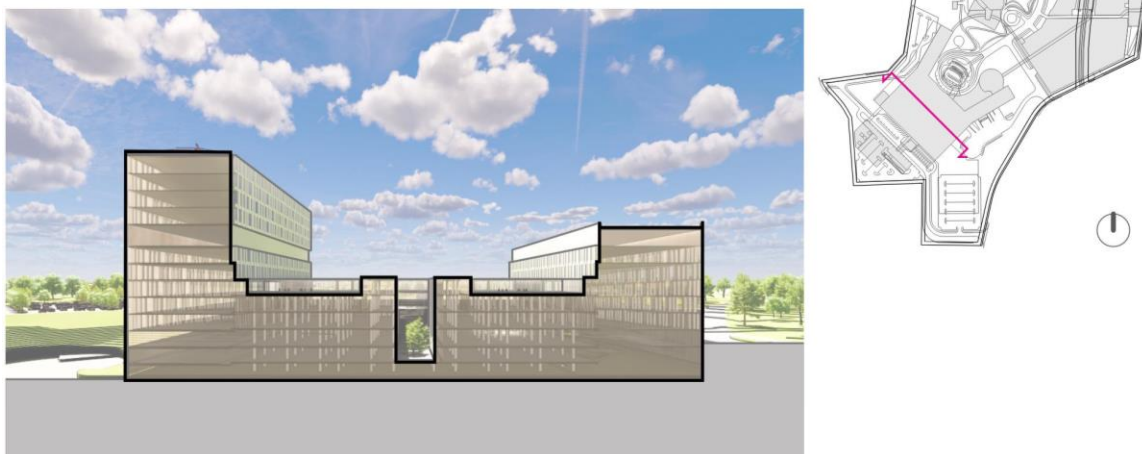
Hospital Section Through Central Podium with North Tower Beyond
